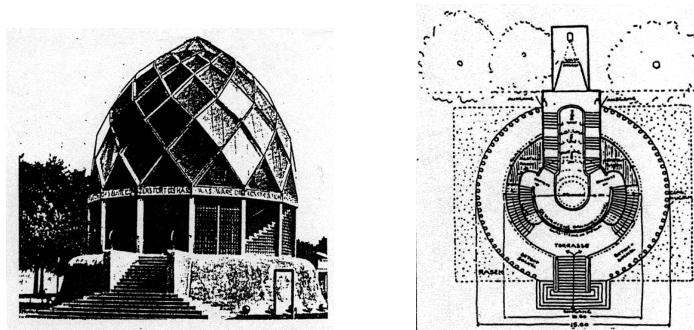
Glass House, 1914; outer view, plan. Source: Suda (1996)
